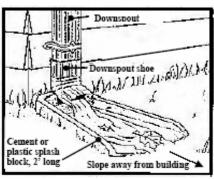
Correct installation of downspout shoe and splash block at foundation wall.
